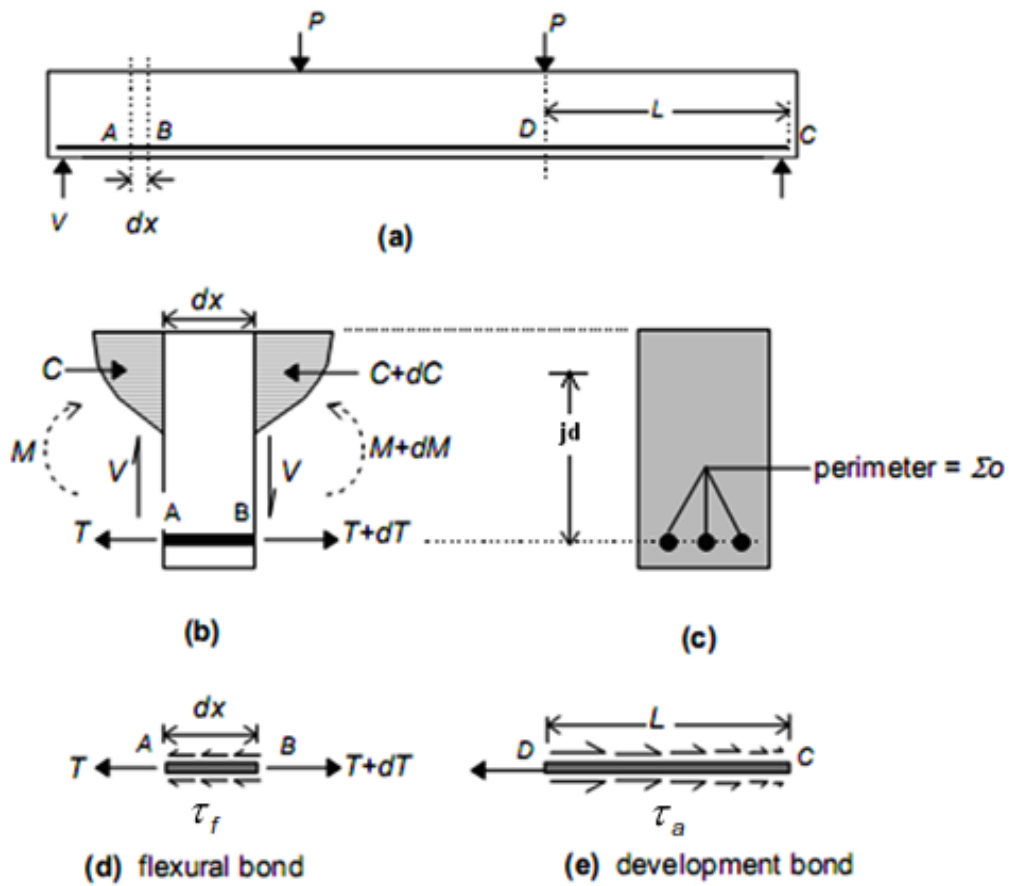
Bond stress in a beam (Pillai and Menon, 2010)
